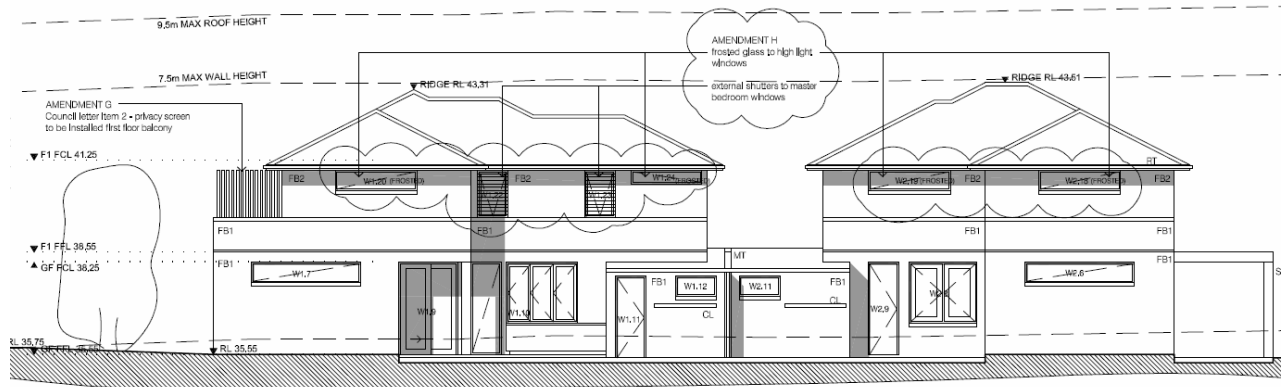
Frosted highlight windows, privacy screen & external shutters to northern elevation.
